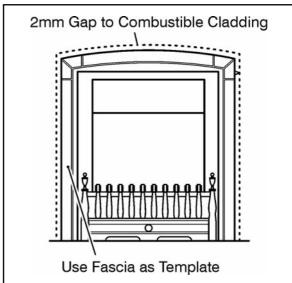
Removal of combustible cladding (Fascia may differ from that shown).
